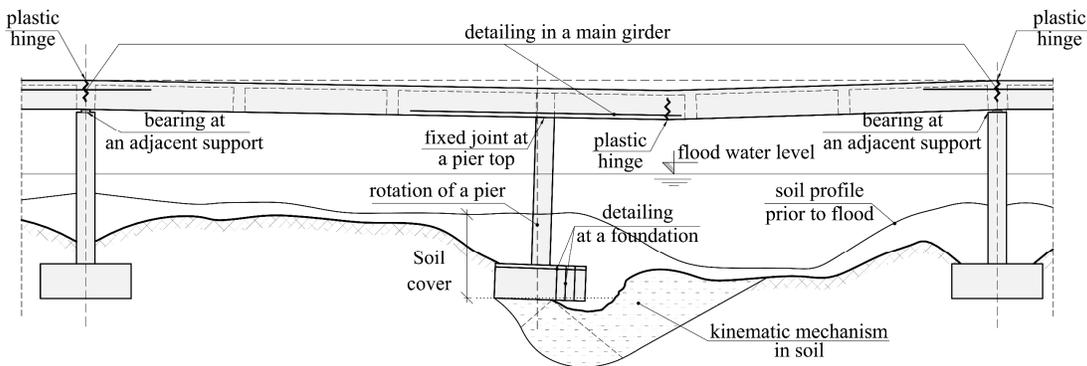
A possible failure mode (FM type 3) of a multiple span RC girder bridge.
